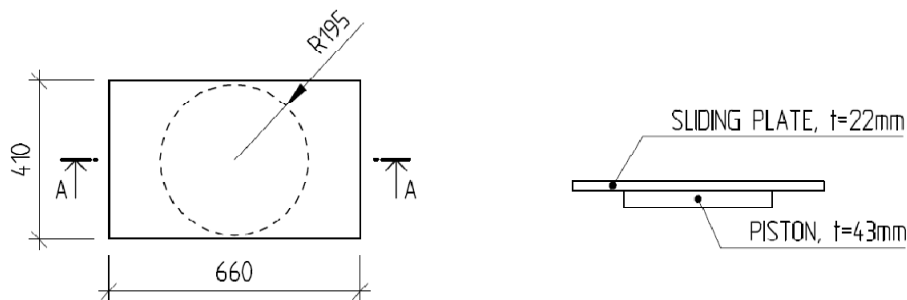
Plan of support 1-1 and 1-2, section A-A to the right [mm].
